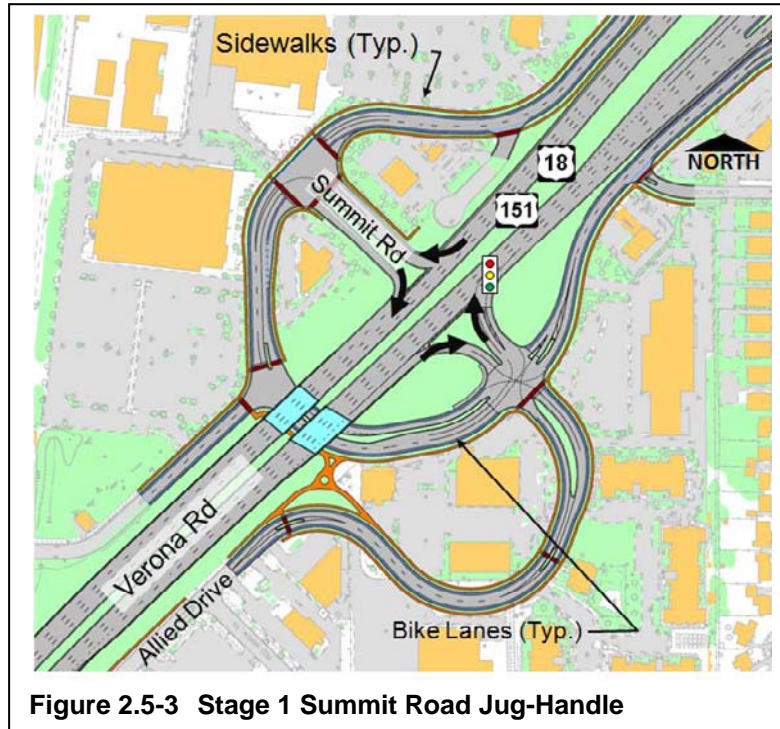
Stage 1 Summit Road Jug-Handle
